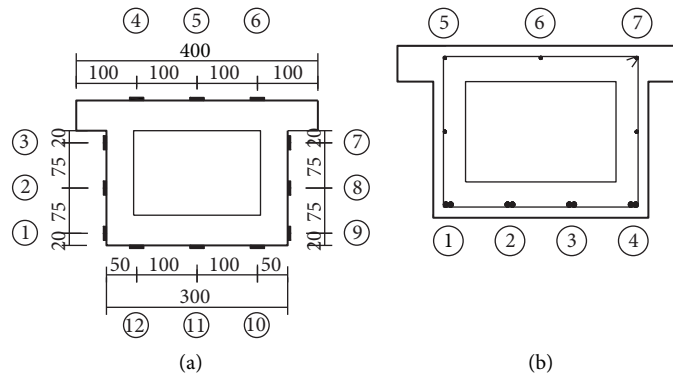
Arrangement of strain gauge of test beam (unit: mm). (a) Arrangement of concrete strain gauges. (b) Arrangement of reinforcement strain gauge.
